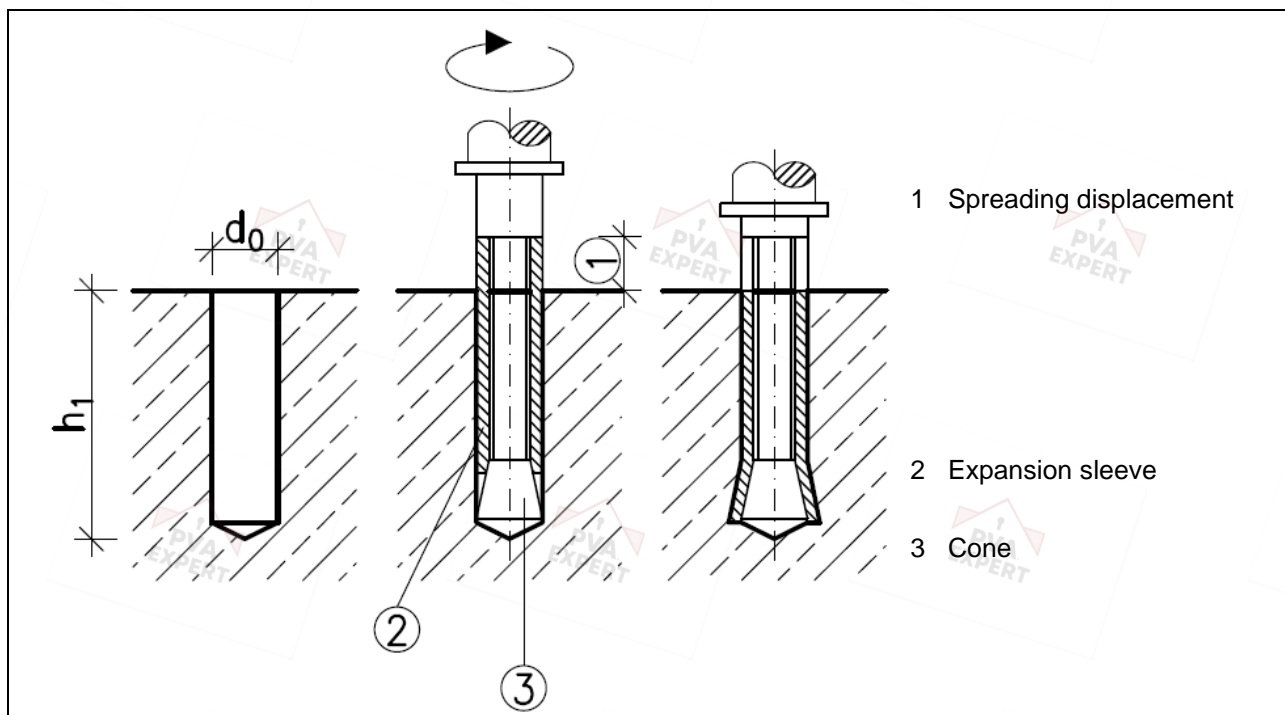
Fastener installation by rotating the fastener sleeve, e.g., by means of the drilling machine; thereby undercutting the concrete and forcing the sleeve over the cone. To facilitate the undercutting, the end of the fastener sleeve can be specially designed (e.g., with cutting pins)
